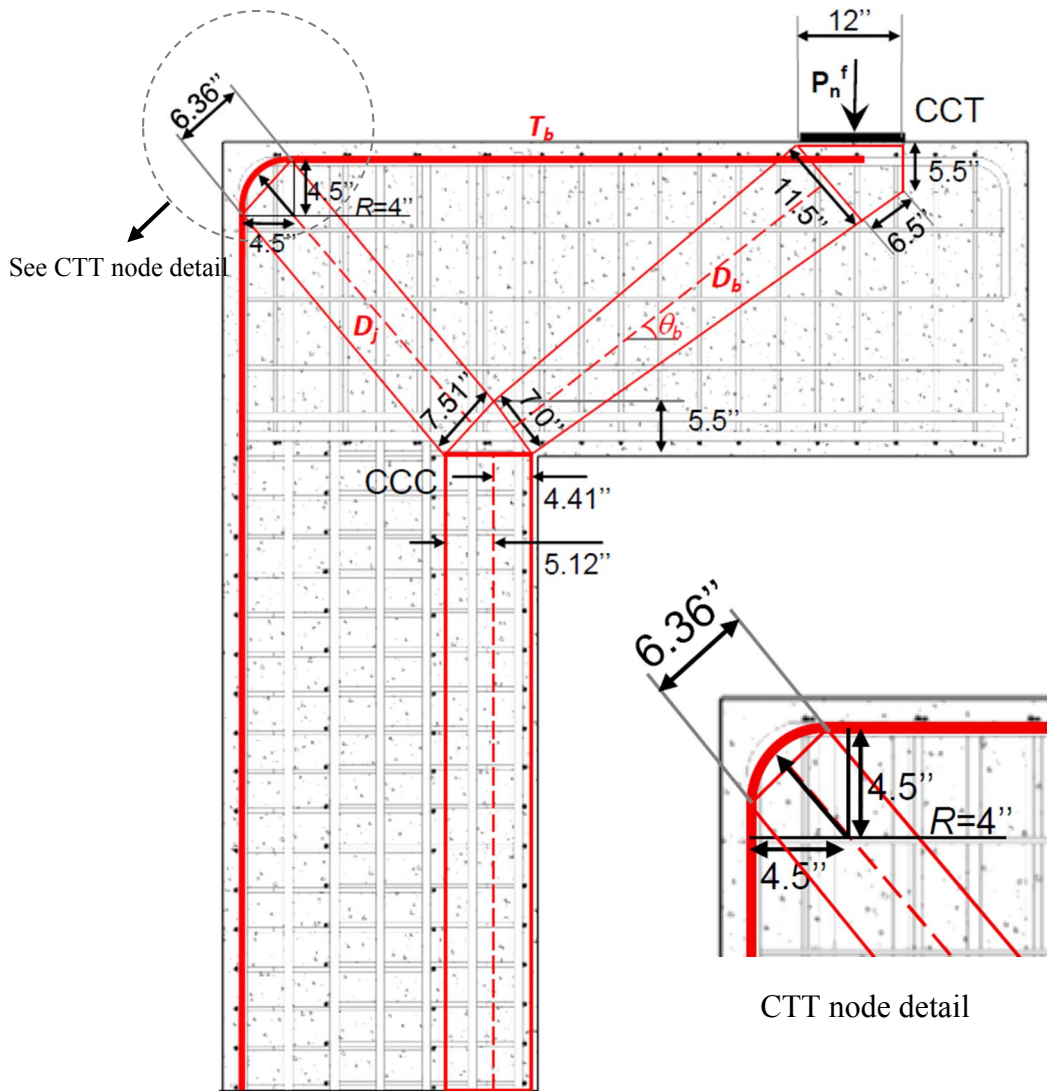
Strut-and-Tie Model for C-Beam Specimen 1.
